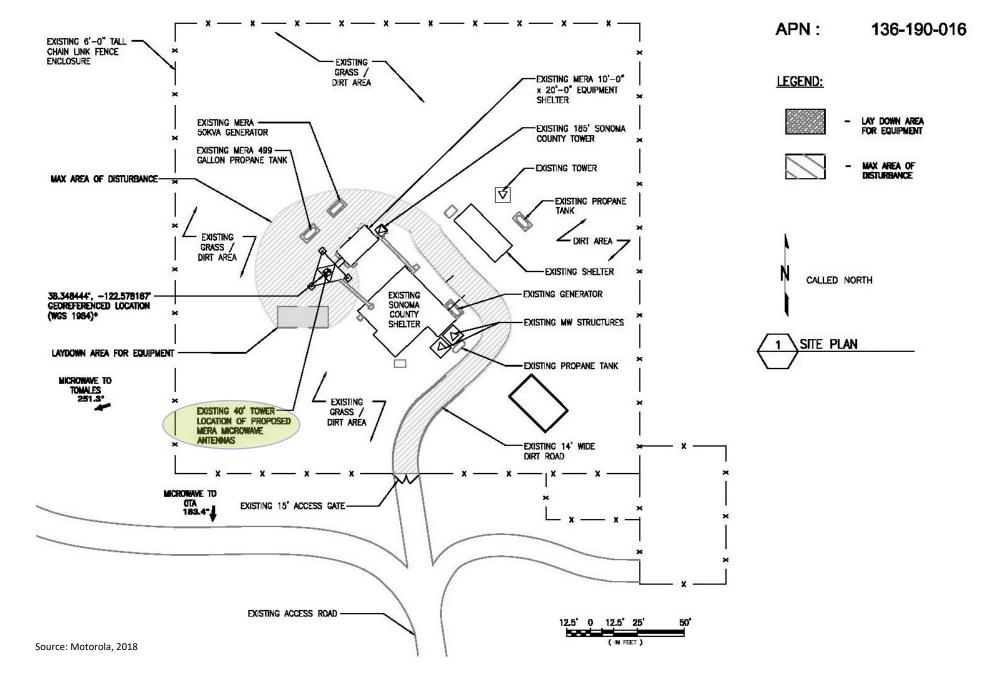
Site 18 - Sonoma Mountain Site Plan
